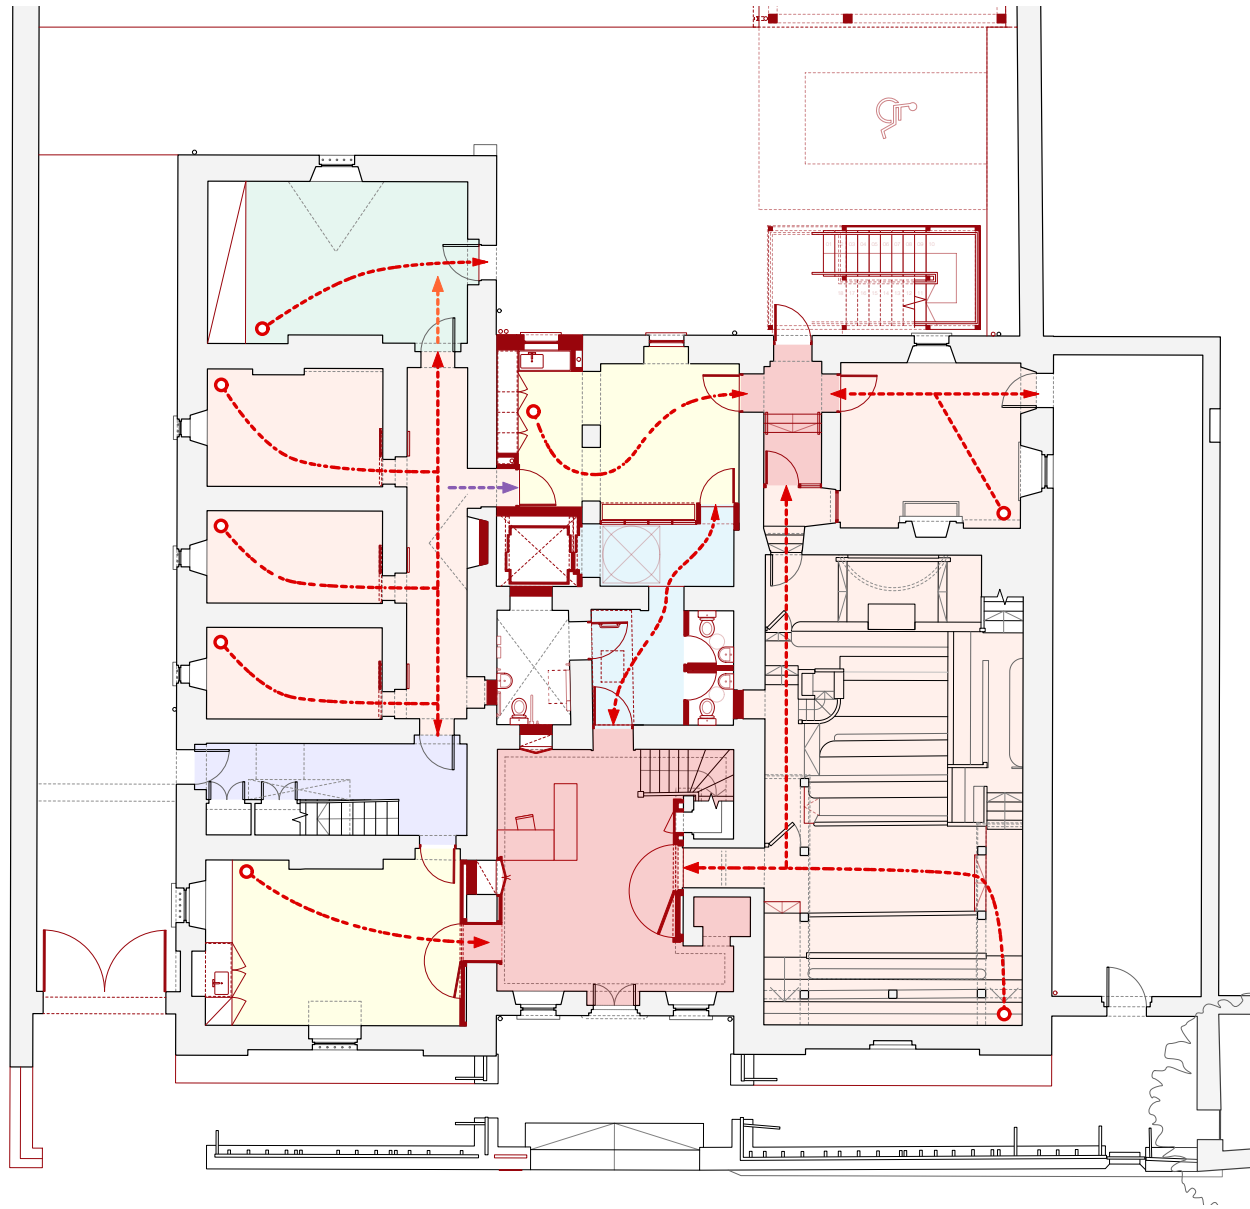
Proposed Fire Strategy Ground Floor Plan
